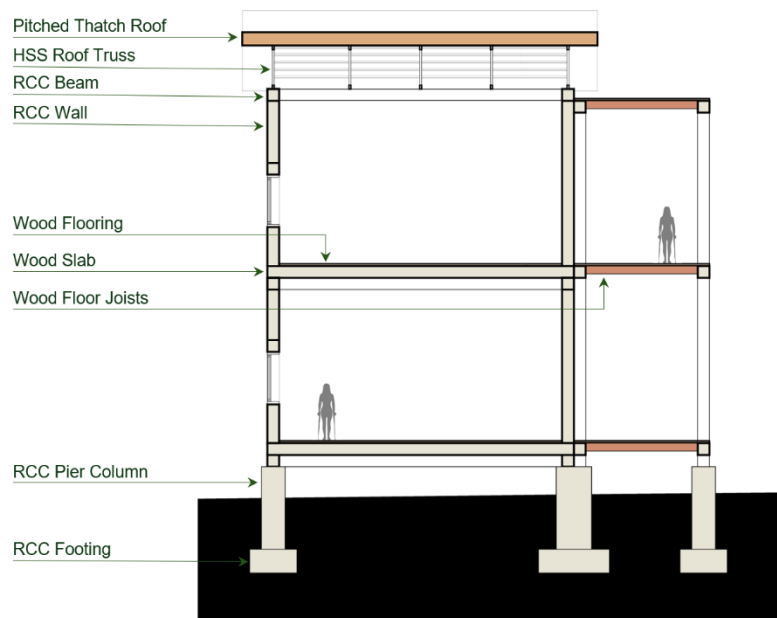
Section of Inpatient Rooms Showing Structure (Source: drawn by author)
